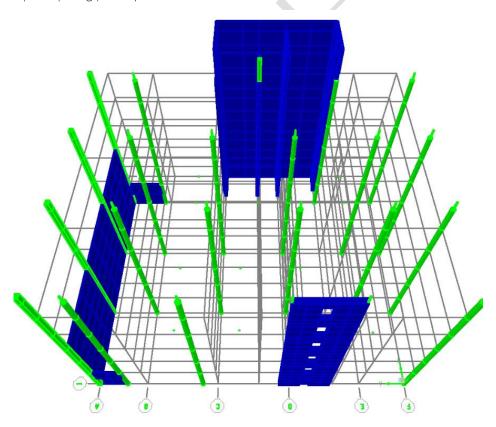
3-D view of ETABS model Ic showing layout of concrete shear walls, concrete masonry walls and columns (beams have been switched off in this view for clarity.
